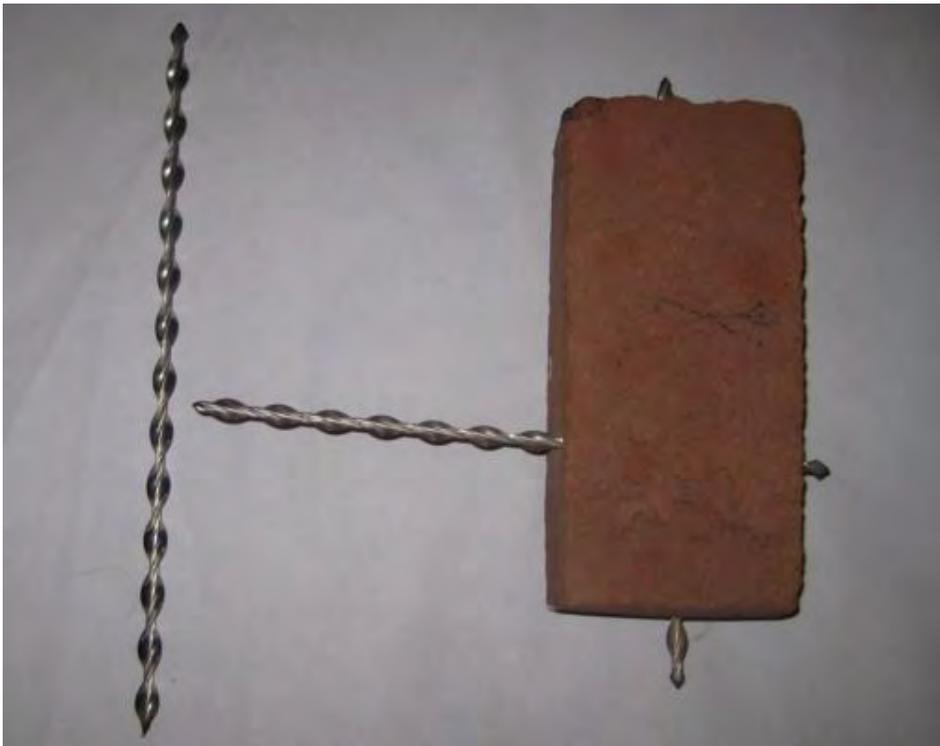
(1): Helical Helifix Masonry Anchors
